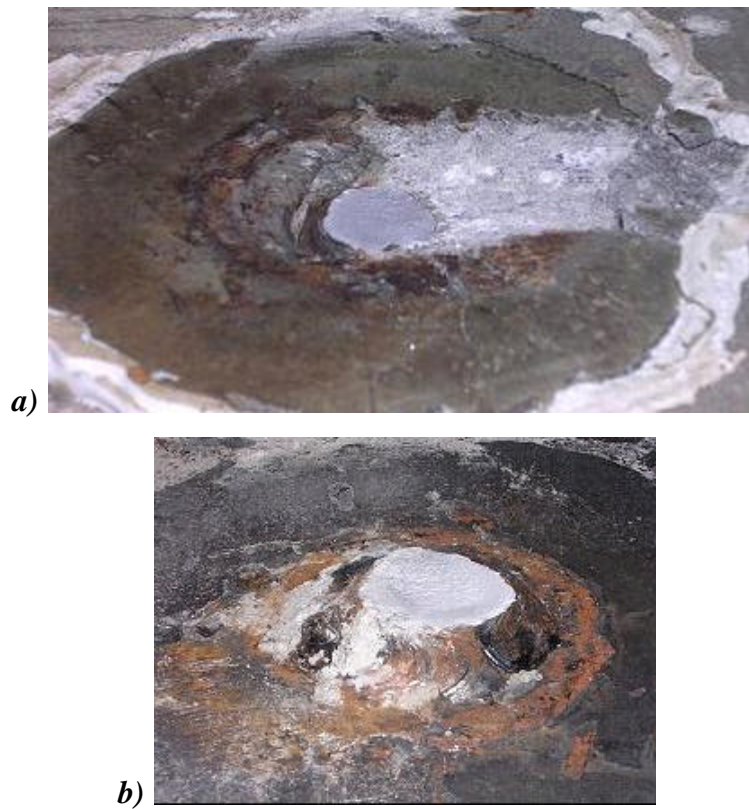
Failed Specimen POSST15(F): a) concrete block, b) steel plate
